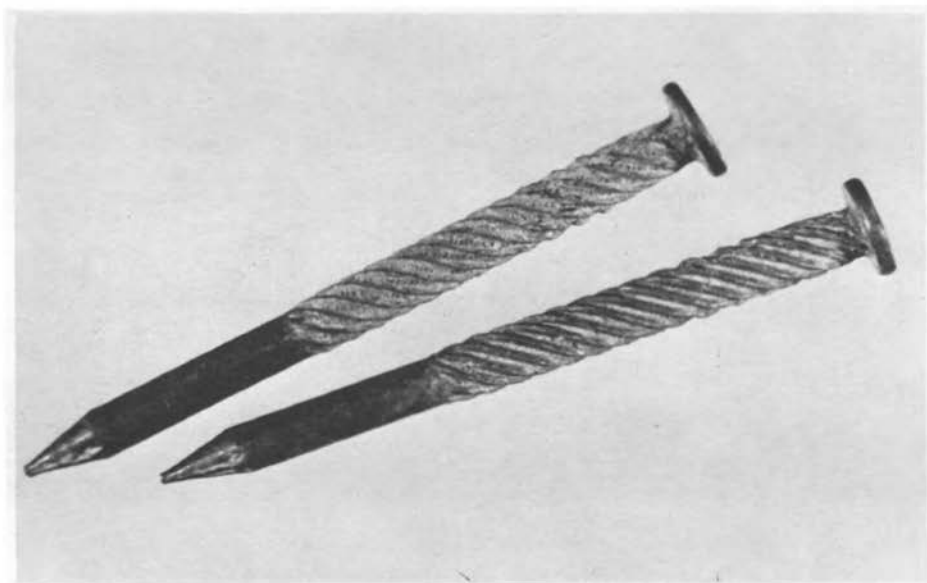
NAIL FOR FASTENING PLYWOOD SUBFLOORING TO
